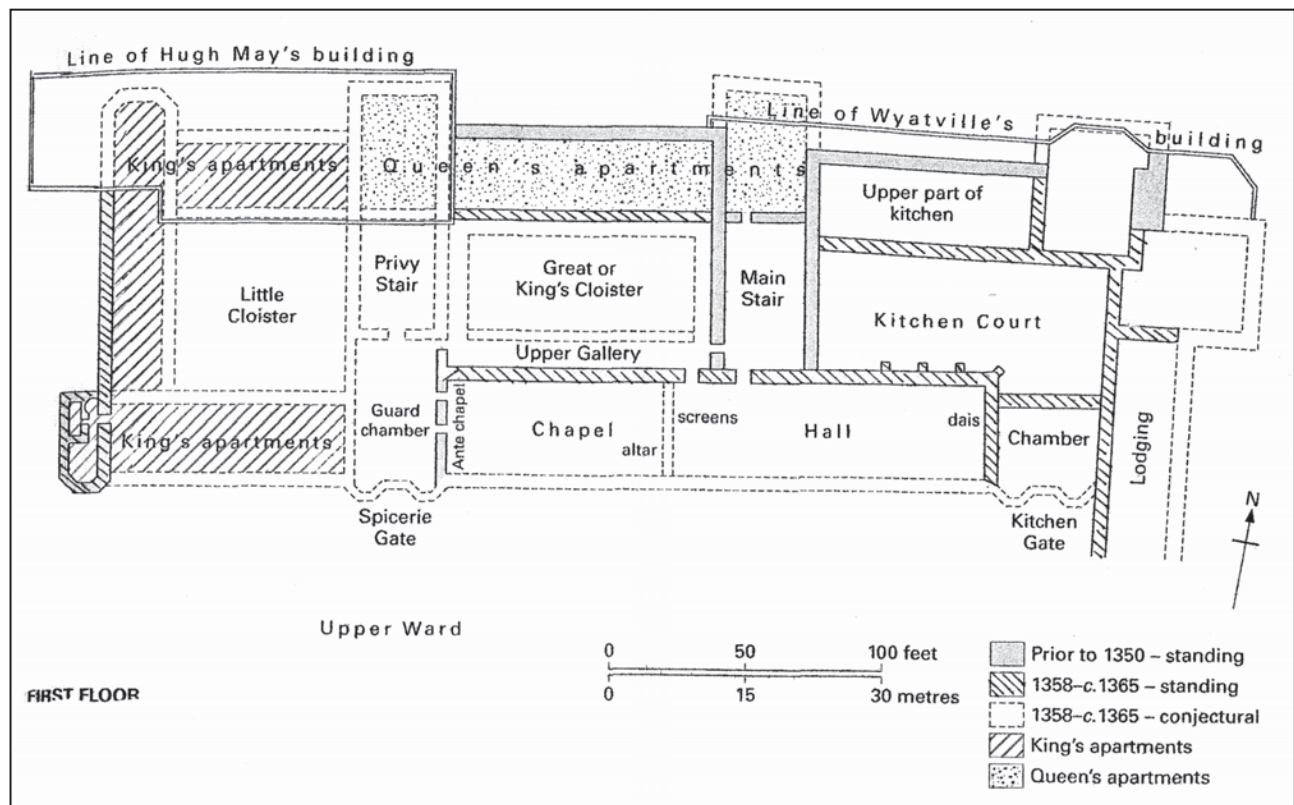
Windsor Castle: first floor plan of royal apartments c.1365
